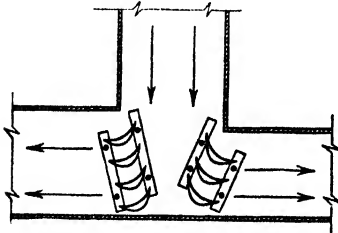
Main-trunk-line duct divided into several size branch ducts, showing application of Ducturns. (Tuttle & Bailey, Inc.)
